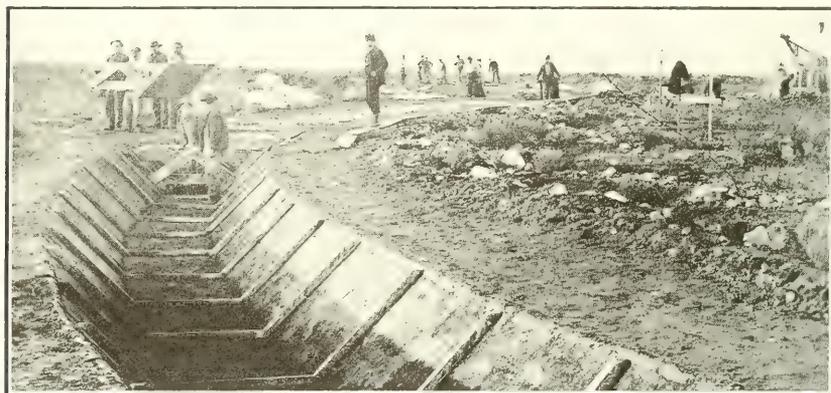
SETTING FORMS PREPARATORY TO CONSTRUCTION OF CONCRETE LINING, NORTHERN PACIFIC IRRIGATION CO., KENNEWICK, WASH.
